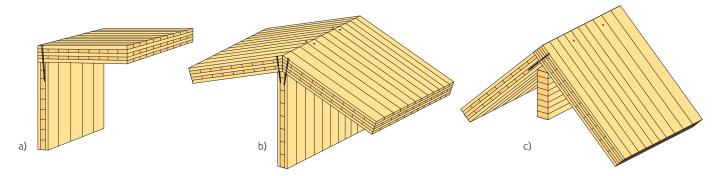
Connecting wall panel and glulam ridge beam to CLT roof.
